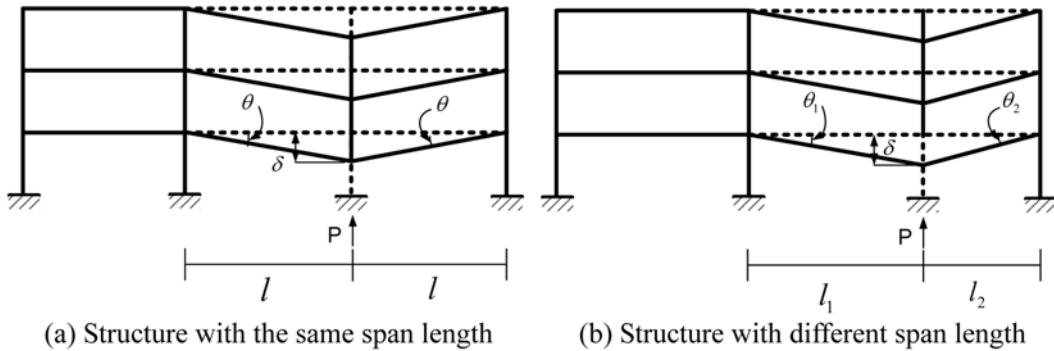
Beam rotation angles and joint deflection caused by loss of a column
